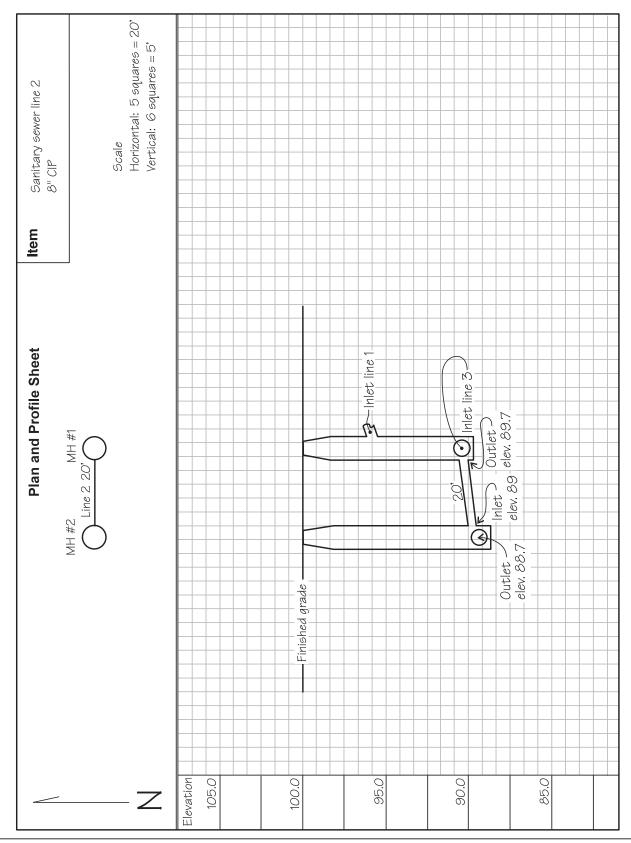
Sanitary sewer line 2, plan and profile sheet
